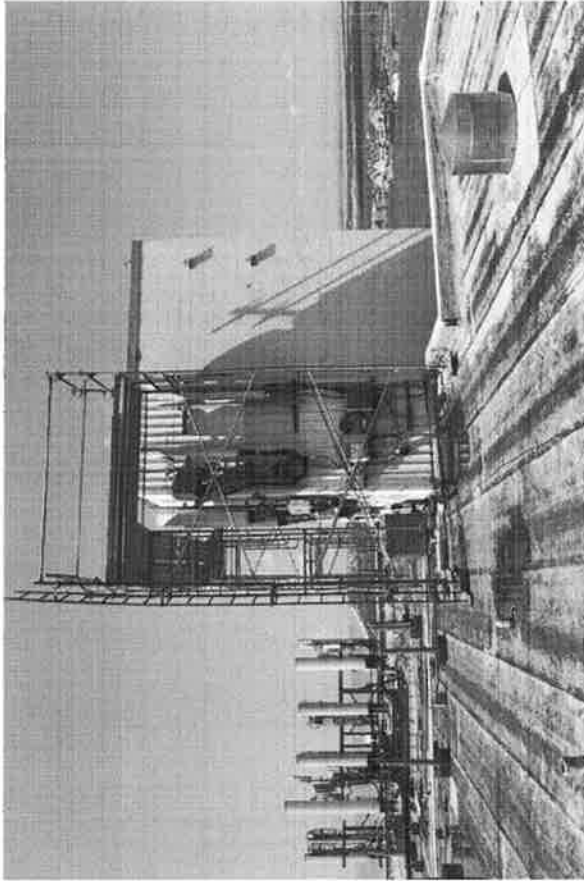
View of aged and deteriorated mod-bit roofing (typical)
